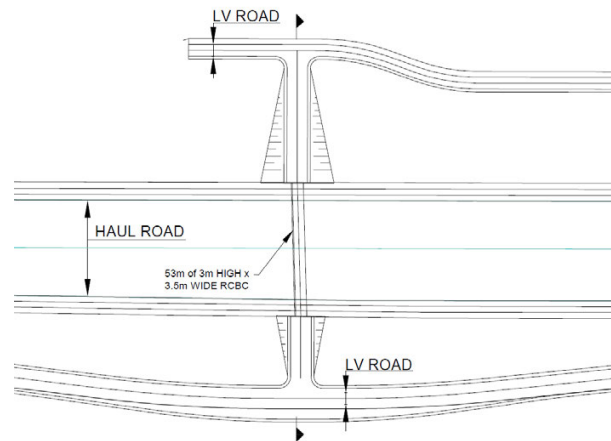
Plan - Crossing of HV and LV – Underpass
